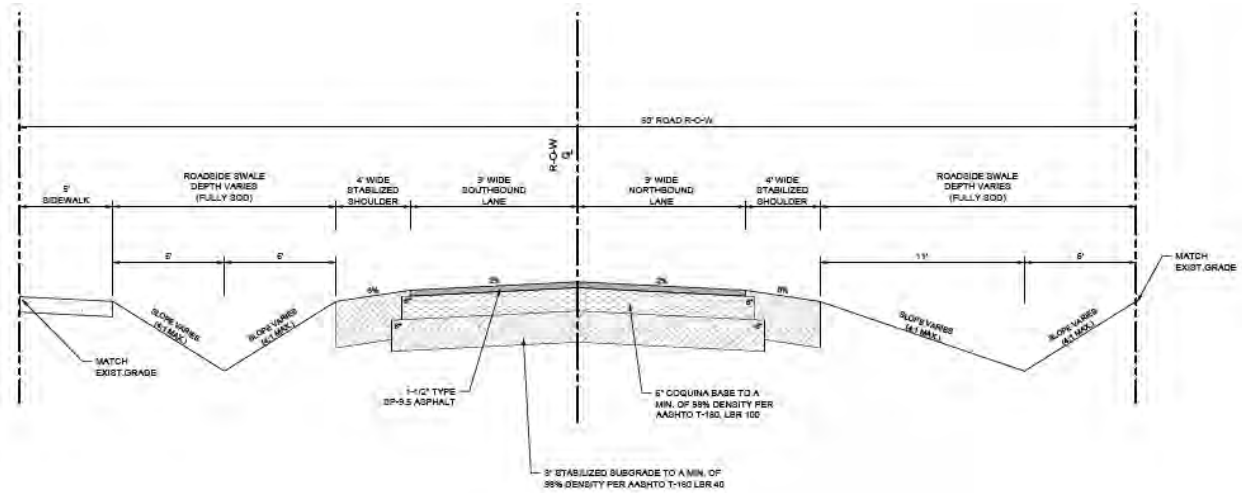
presents the typical section that will be utilized north and south of CR512 west of Broadway within the 80' road rights-of-way. The design utilizes roadside swales as the means to direct such flows to the nearest sub-lateral ditch. The swales, in addition to the alleyway swales presented in Figure 6, provide positive drainage for all residential historic lots of record in this portion of the study area and provide important stormwater storage during flood events.
